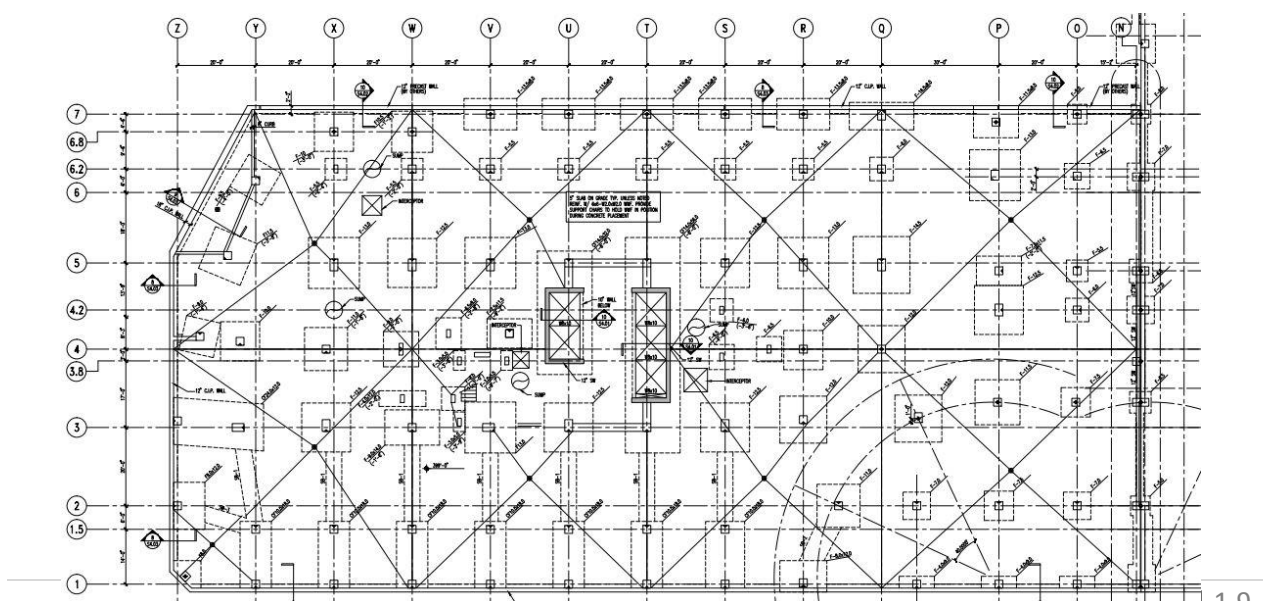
Foundation Plan (refer to Appendix for Enlarged Image)
